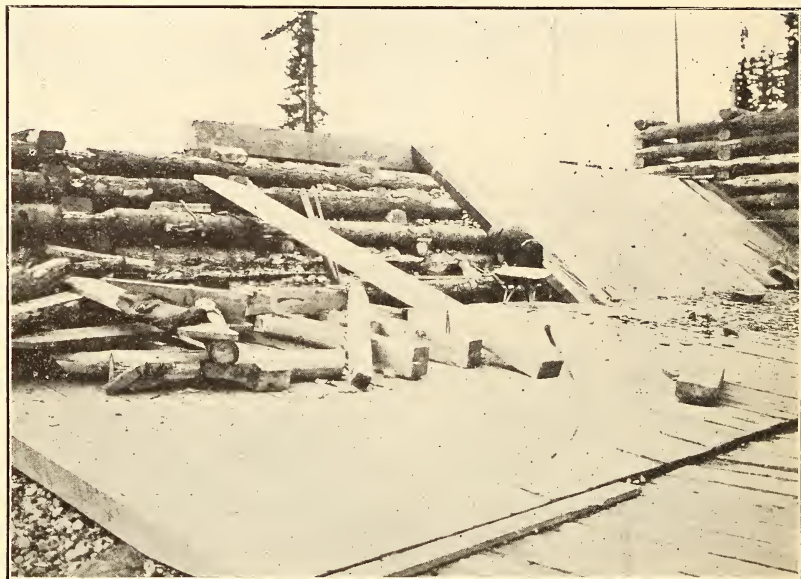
Lake Keechelus Dam, apron and spillway under construction, crest log in place and apron completed on east end.
